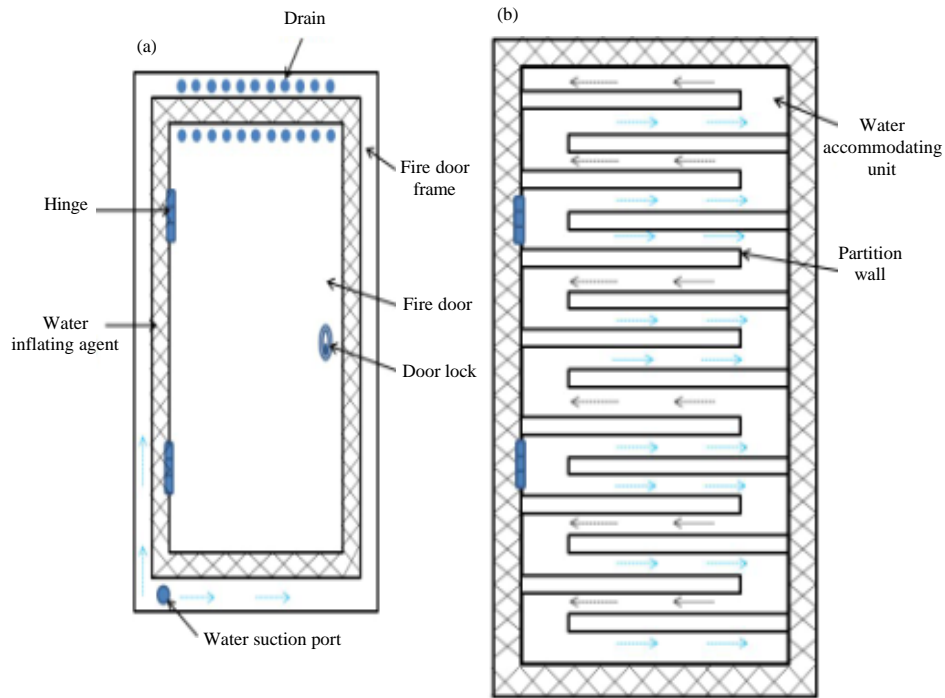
A structure of the newly introduced fire door and a fire door frame: a) Fire door and fire door frame and b) Inside of fire door plan
